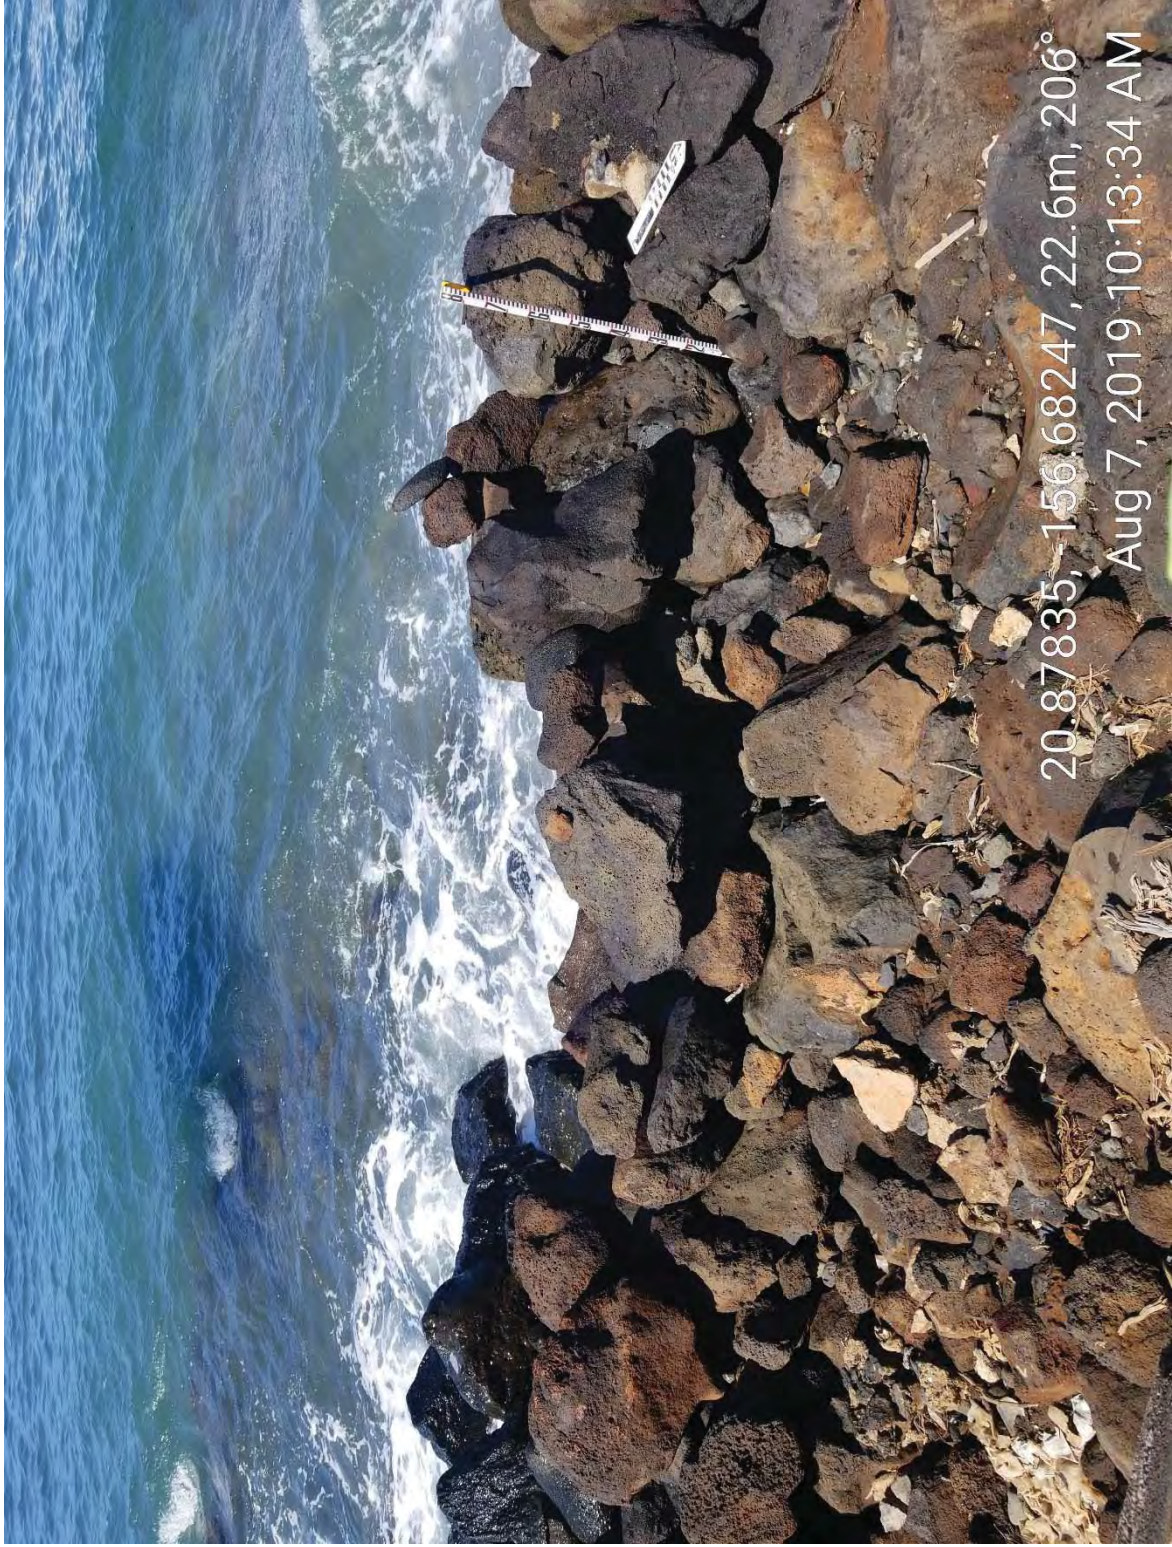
Photographic View of Modifications to the Area 2 Seawall. View to South.
